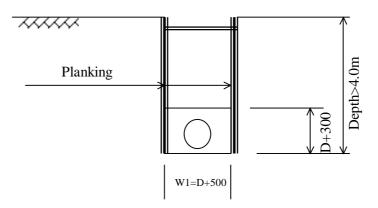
General Excavation Section Exceeding 4.0m deep
